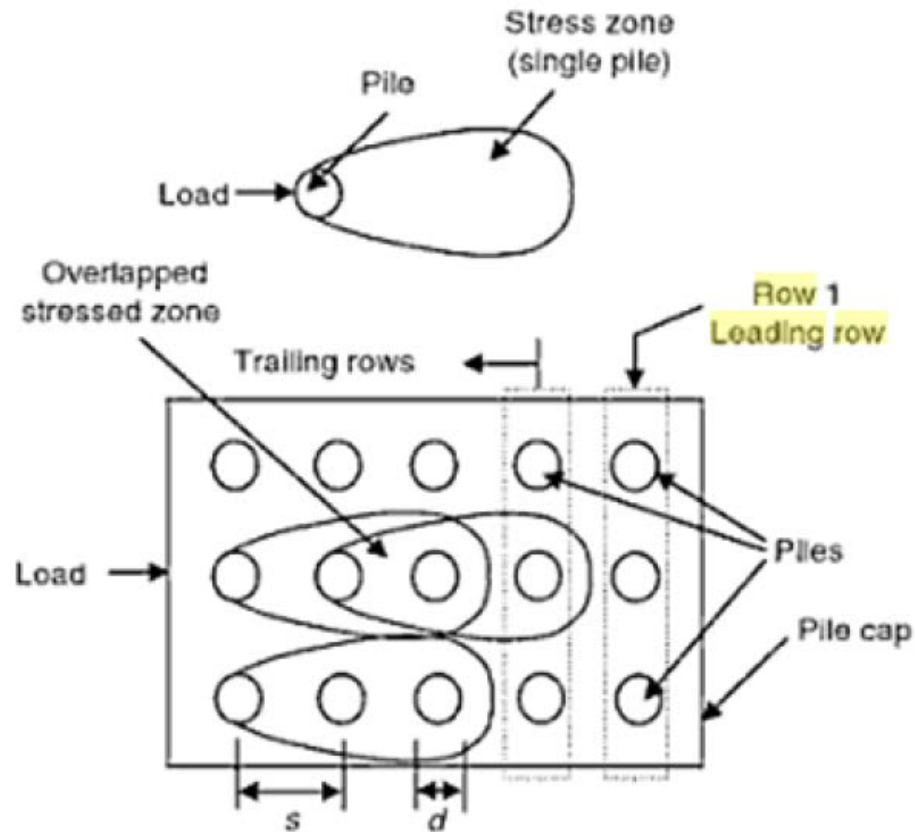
Typical stress zones for pile foundations under lateral load.
